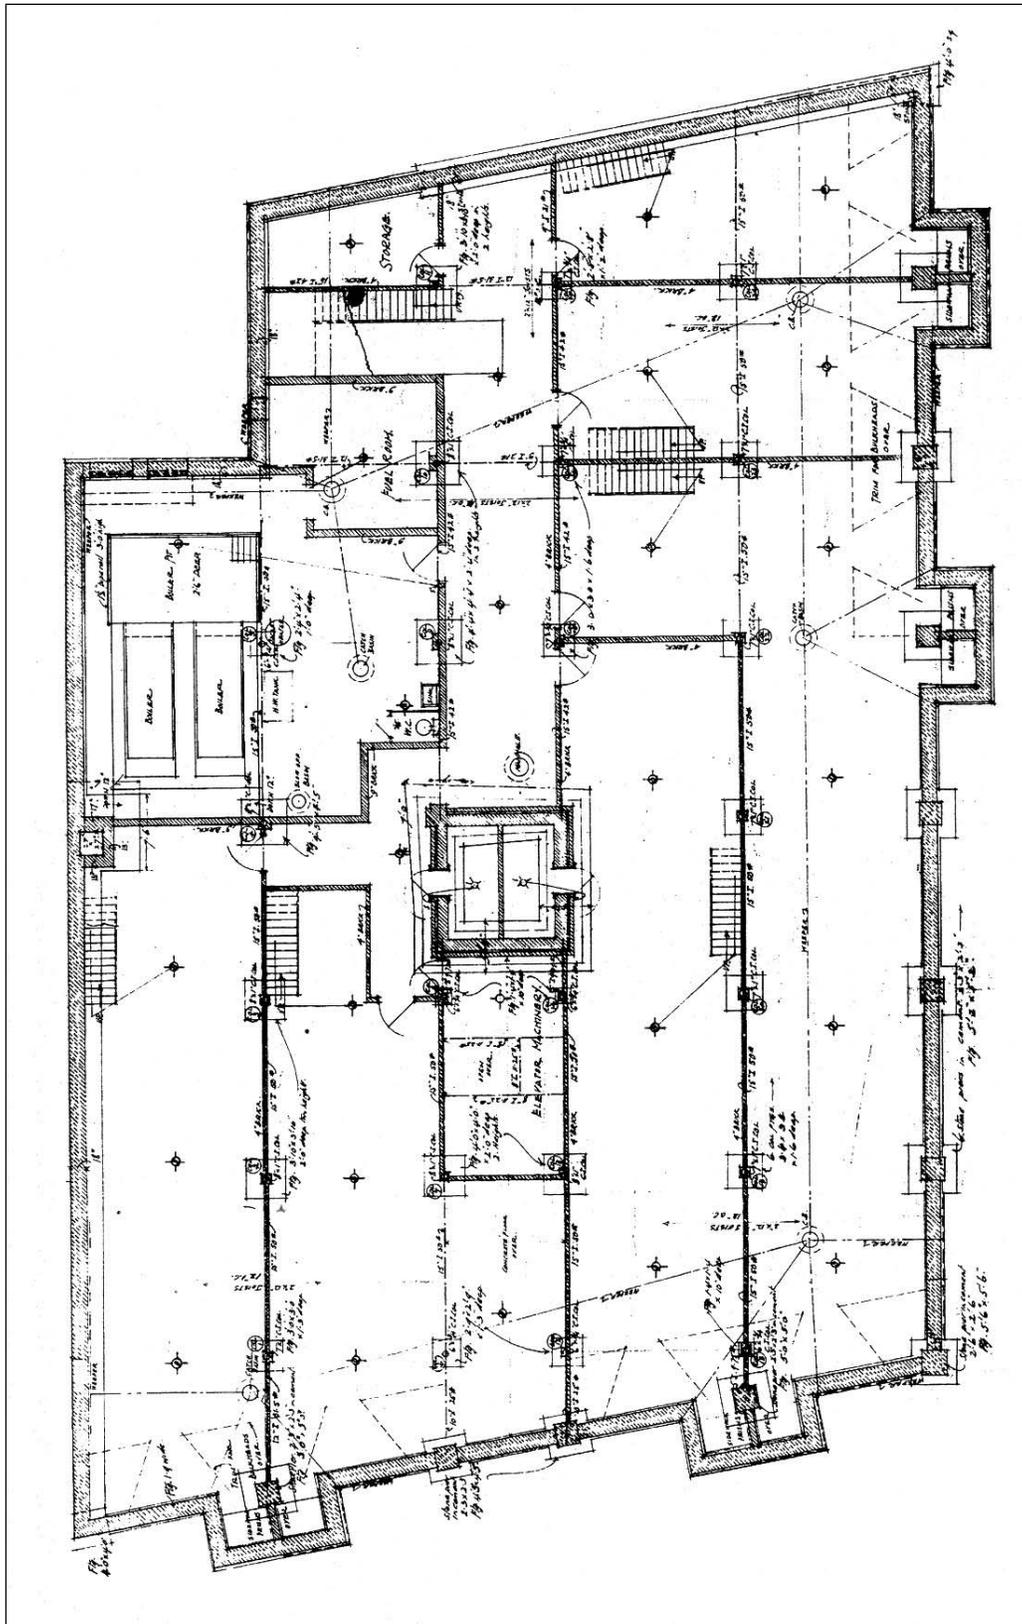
Architect’s plans, “Basement Plan,” 1912. (Courtesy of City Archives, Plan #1399/1912.)
